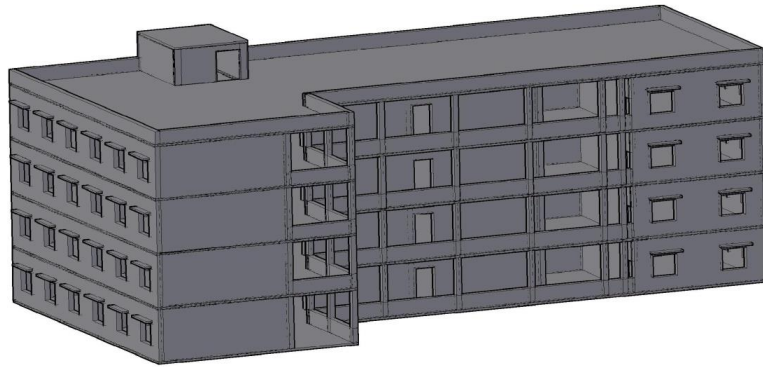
Mechanical department of MGITER College (AutoCAD 3d drawing)
